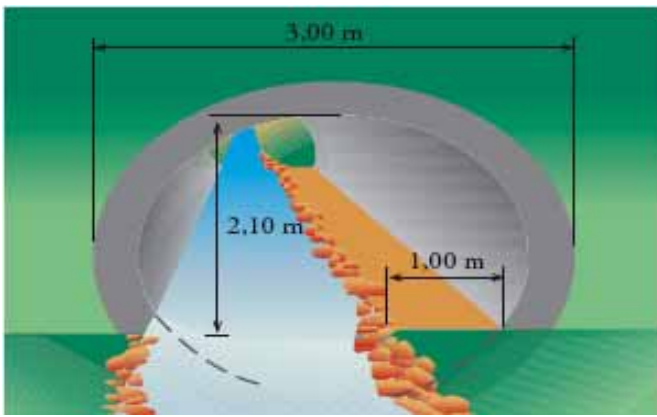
Type IIIa passage: steel pipe with 1 m wide bench
